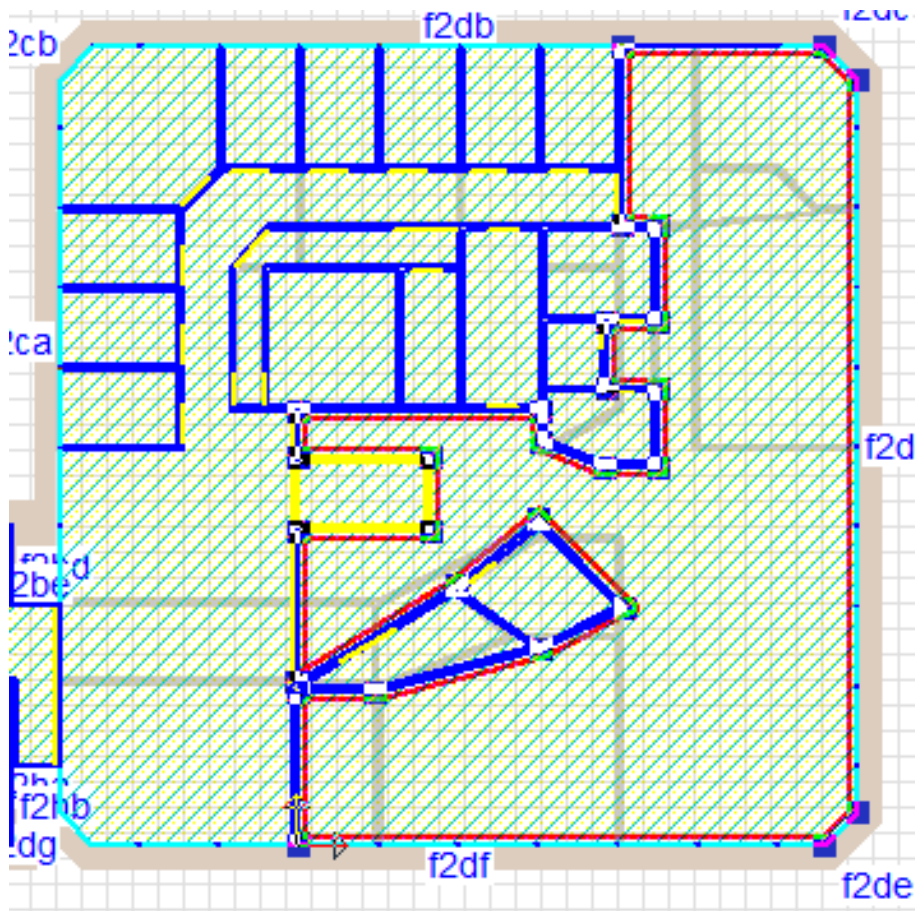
Location for Landscape.4241 at the second floor in Building 4 from IDA ICE
